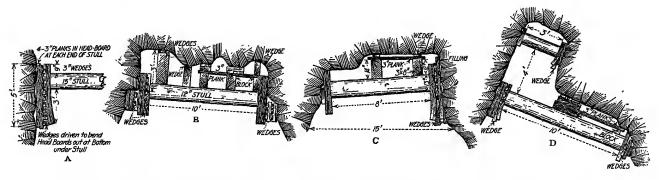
DETAILS OF CATCHING-UP STULLS AND BLOCKING UNDER BACK IN STOPES WHERE CAVING HAS CEASED
